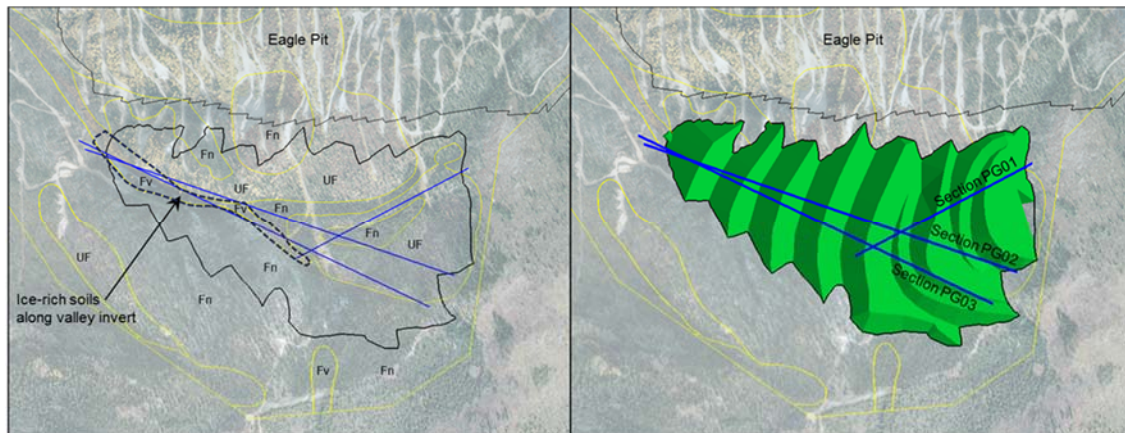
Location of Eagle Pup WRSA Slope Stability Cross Sections
